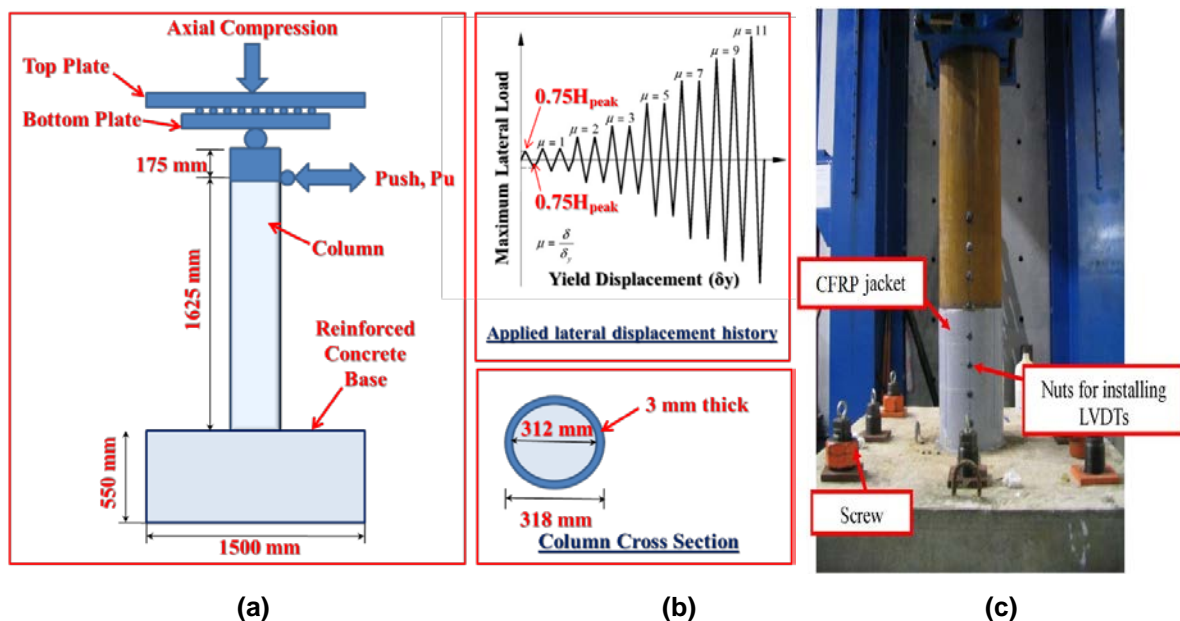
Test set-up details (dimensions are in mm) [41]: (a) Schematic diagram of test set-up, (b) Cross-section and lateral displacement history, and (c) Column wrapped with a CFRP jacket.
